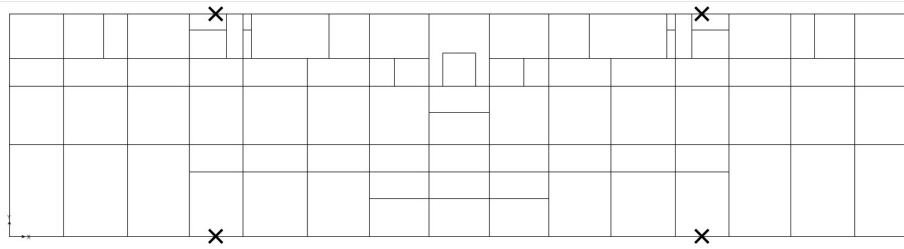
Damper Placement at 4th floor (R-X); MSSSA: 0 damper, ODAM: 4 dampers
